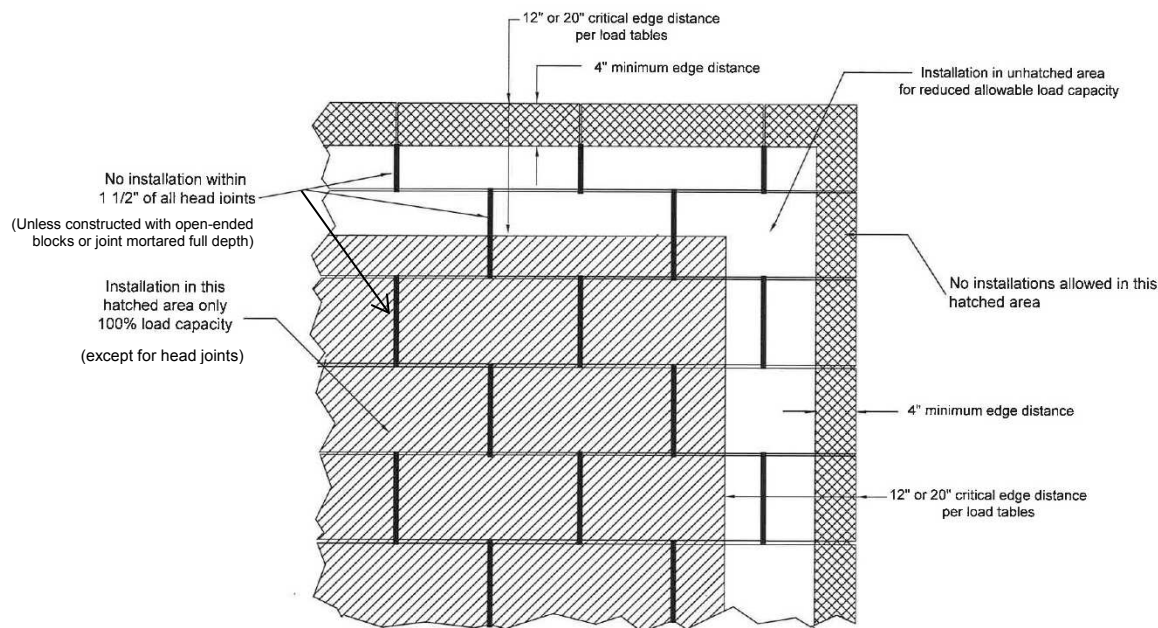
ILLUSTRATION OF PERMISSABLE LOCATIONS FOR RED HEAD C6+ ADHESIVE ANCHORS INSTALLED INTO THE FACE OF GROUTED CONCRETE MASONRY WALL (ELEVATION VIEW)
